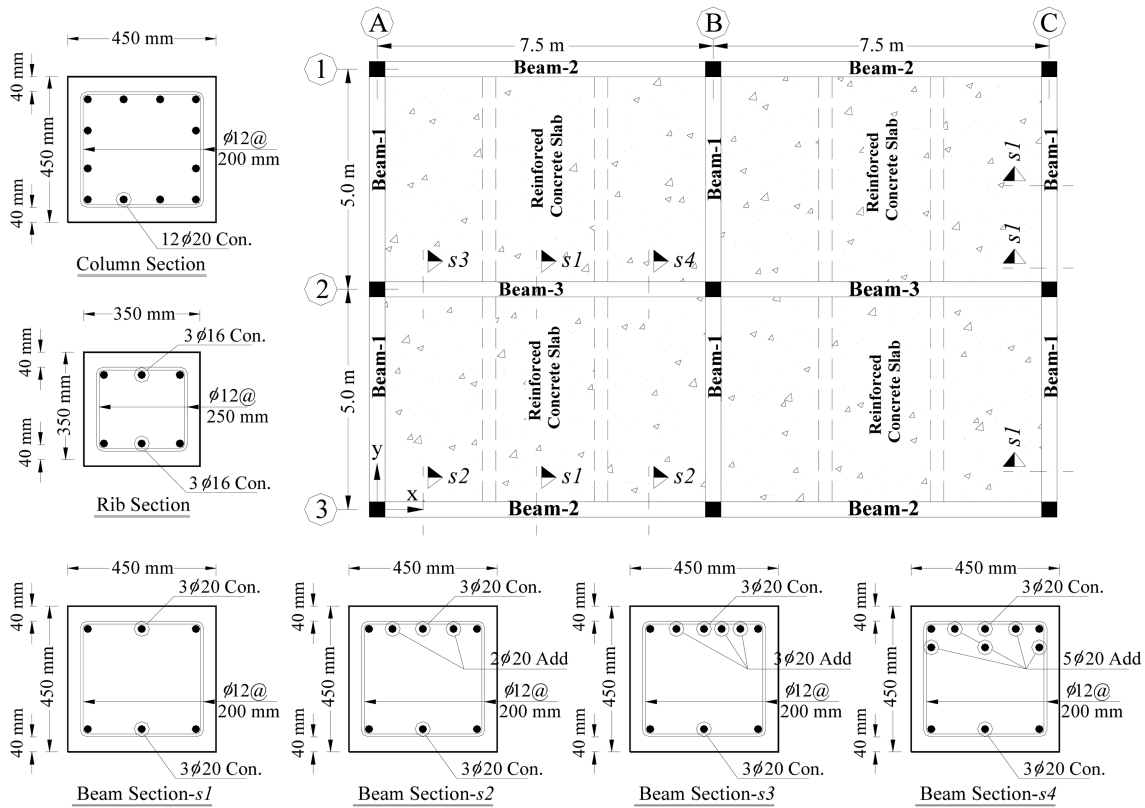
Plan of the 3-storey building and the sections reinforcing details
